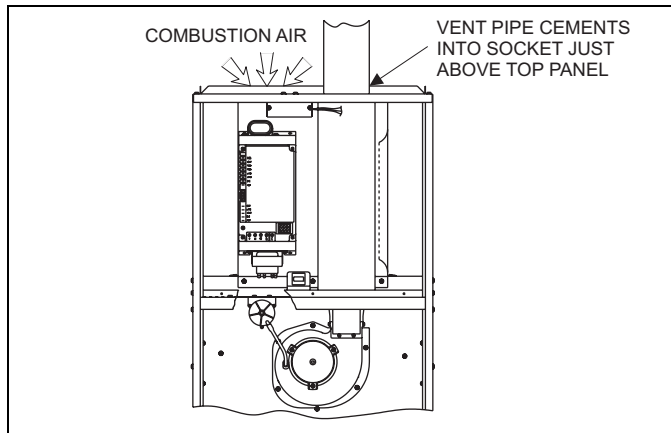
Combustion Airflow Path Through The Furnace Casing to the Burner Box
